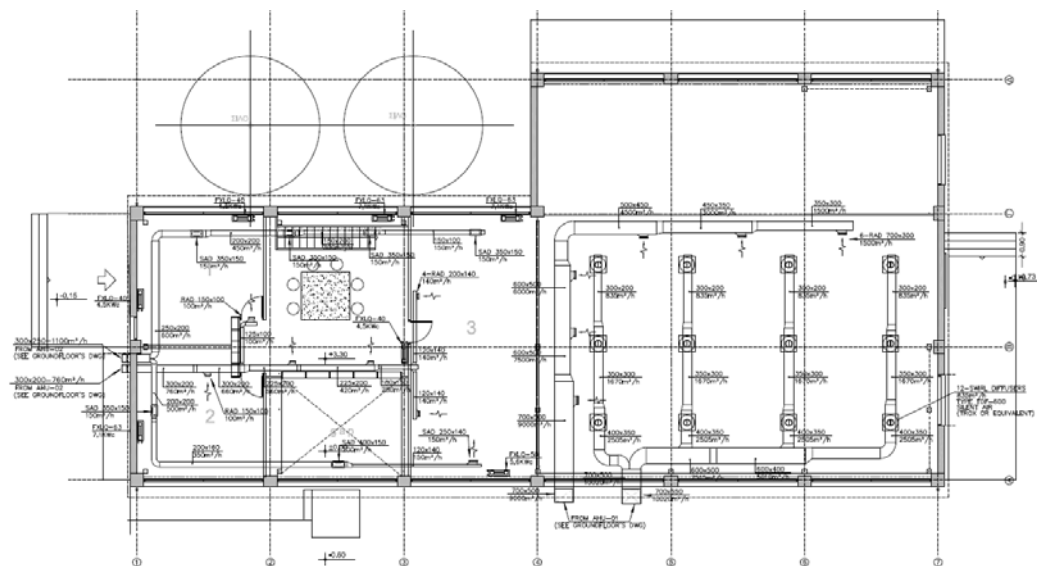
Airduct layout for the heating, cooling and ventilation of the building.
